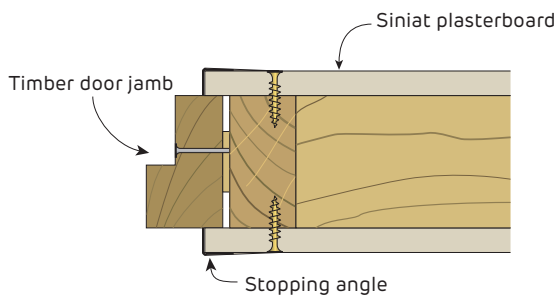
Typical Timber Door Jamb With stopping angle Plan
